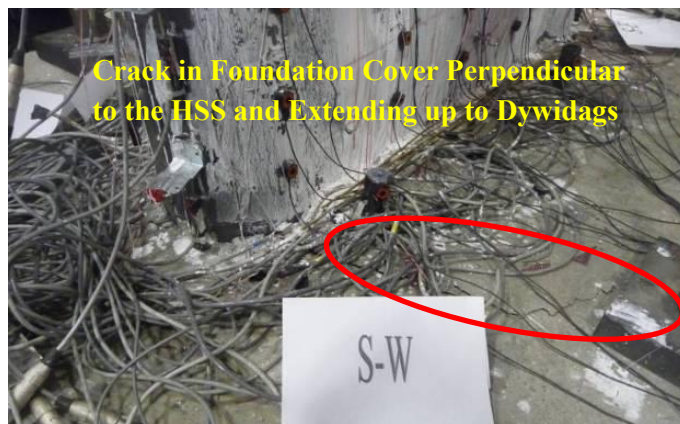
Crack in Foundation Top Cover of Specimen CFSSP-B1 at 2.67% Drift
